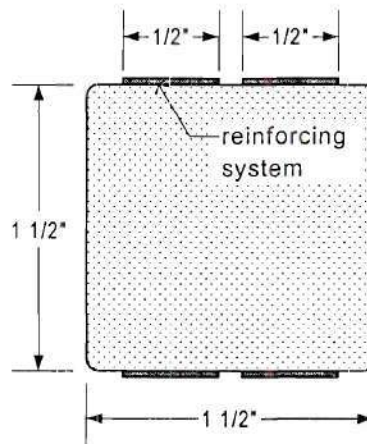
Cross section of RP beam with reinforcing system applied externally
